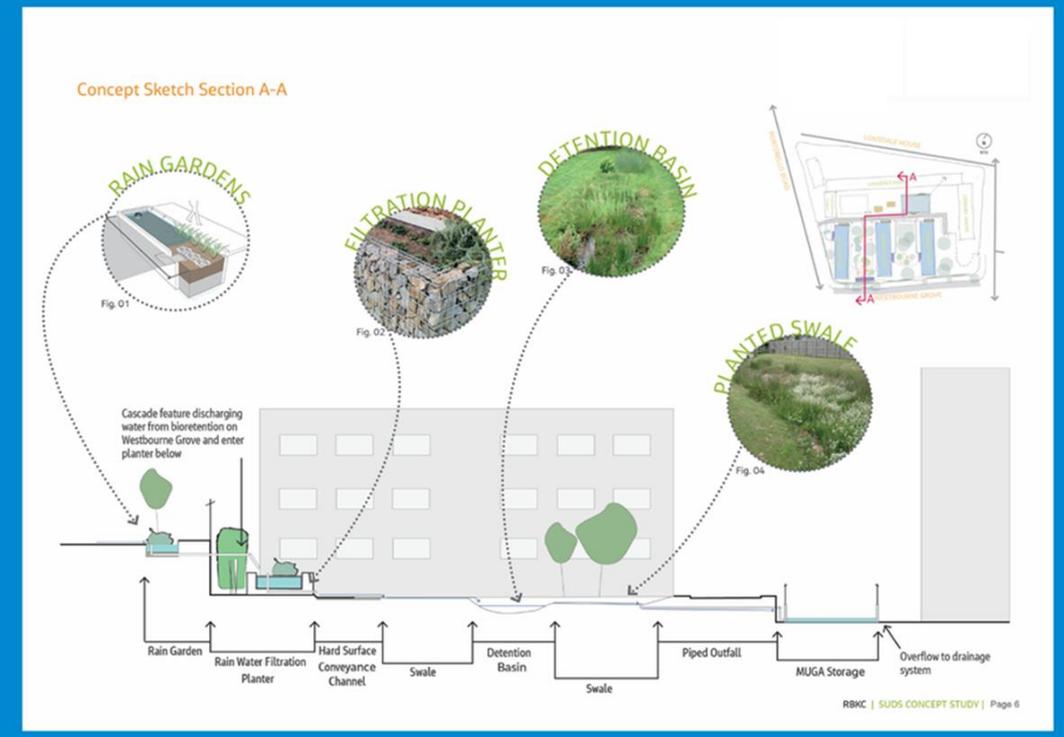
SuDS in Portobello Court project. Draft concept design and sketch sections. The proposed SuDS system will collect rainwater from the roof and Westbourne Grove and move it to landscaped areas and attenuation system.
